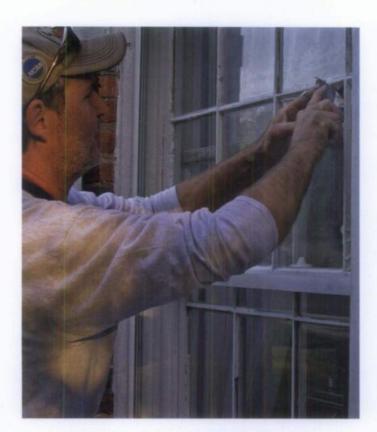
Glazing putty should be maintained in sound condition to prevent unwanted air infiltration and water damage. New glazing putty should be pulled tight to the glass and edge of the wood, creating a clean bevel that matches the historic glazing.
